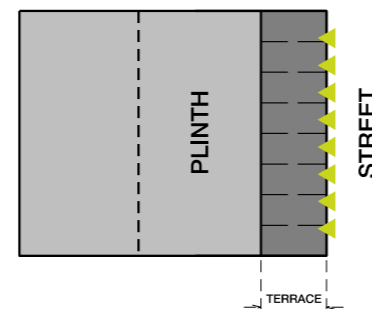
Plan diagram: Access to Terraced Houses & plinth typology.
